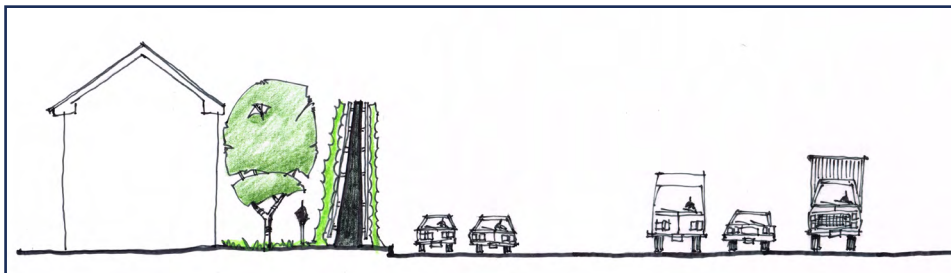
A wall barrier, shown in section, with planted vegetation along the side of the structure blocking exposure to near-highway pollutants for a residential building. The barrier is approximately 25 feet tall.
